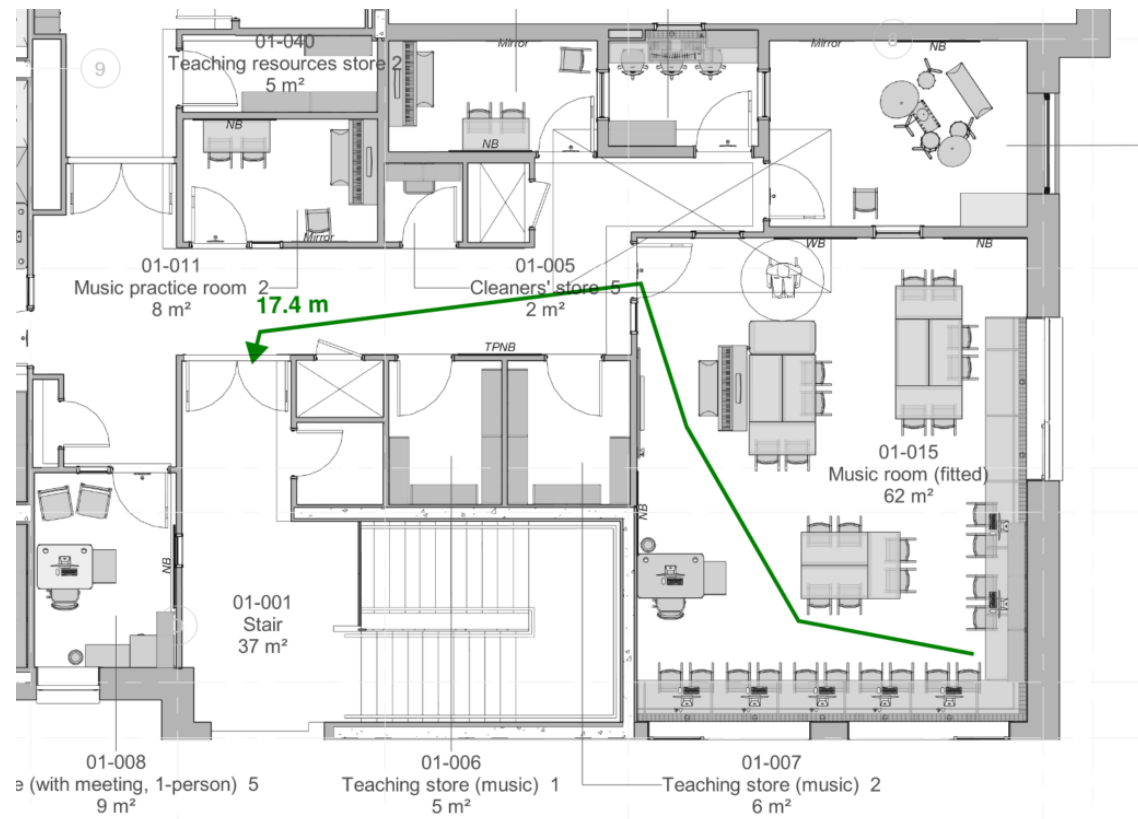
First Floor Travel Distance on FFE layout (Actual)
